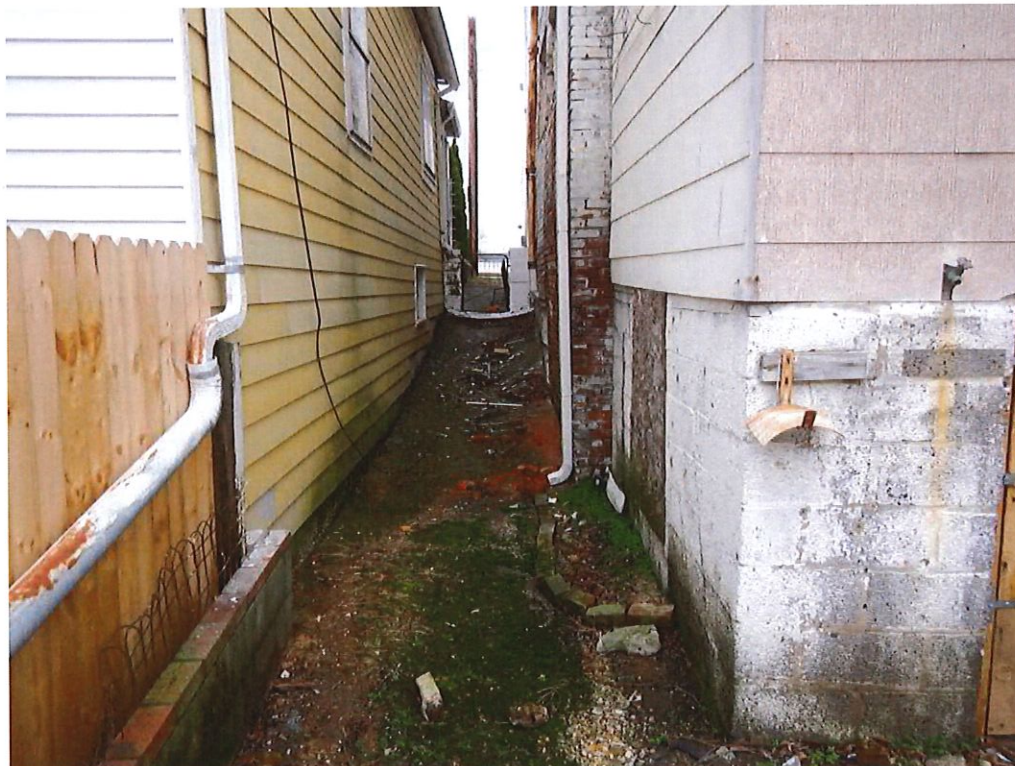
Looking northward into the space between the subject building and the residence to the west.
